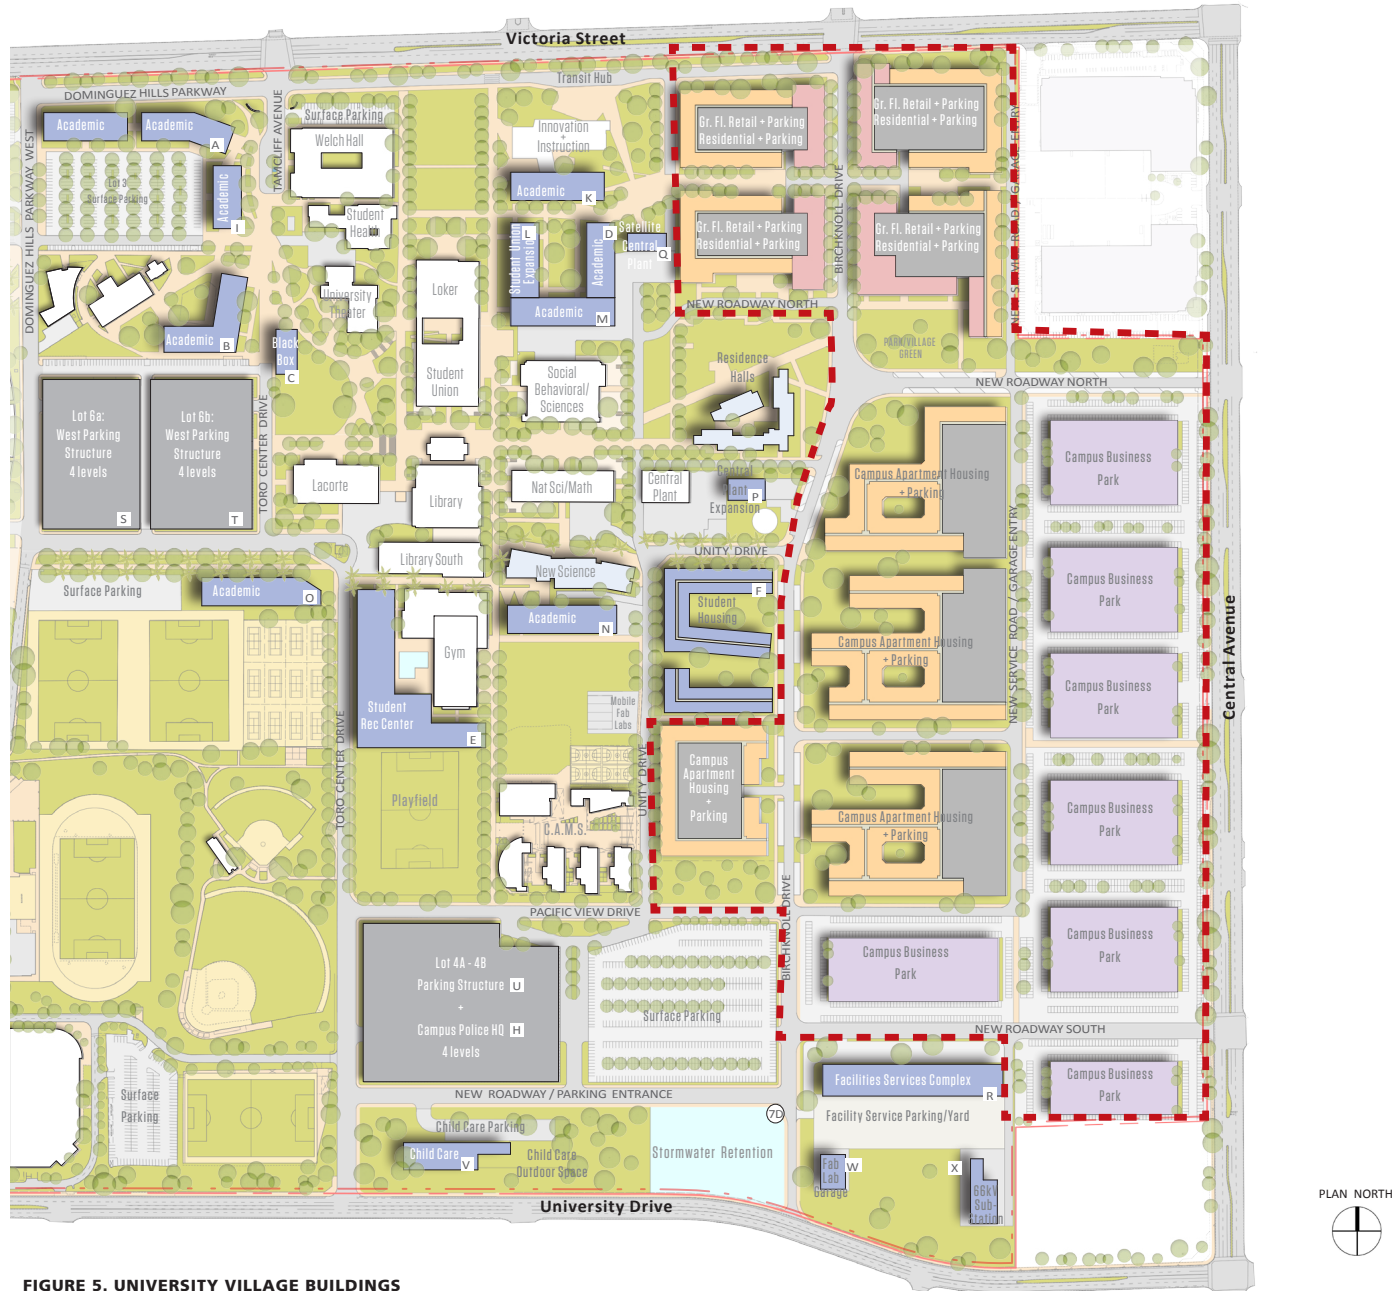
UNIVERSITY VILLAGE BUILDINGS
